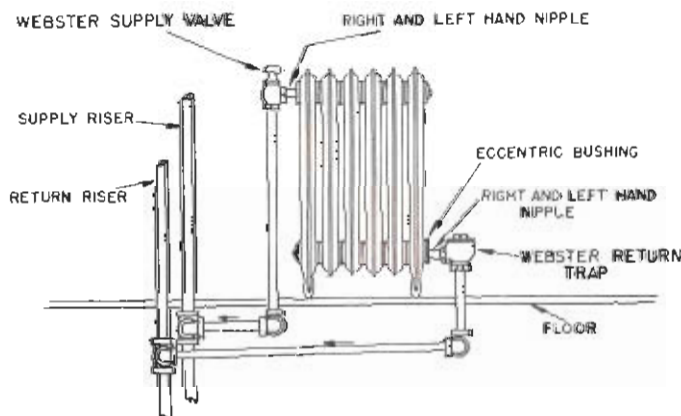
Method of Connecting Webster Radiator Trap and Webster Supply Valve with Female Inlet and Outlet to a Standard Radiator Using Right-and-Left Hand Nipple
